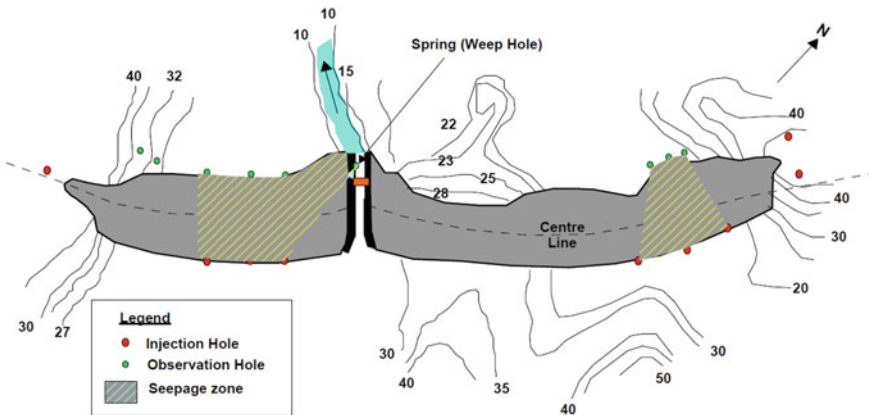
Plan of Salaulim Dam showing excessive seepage zones
